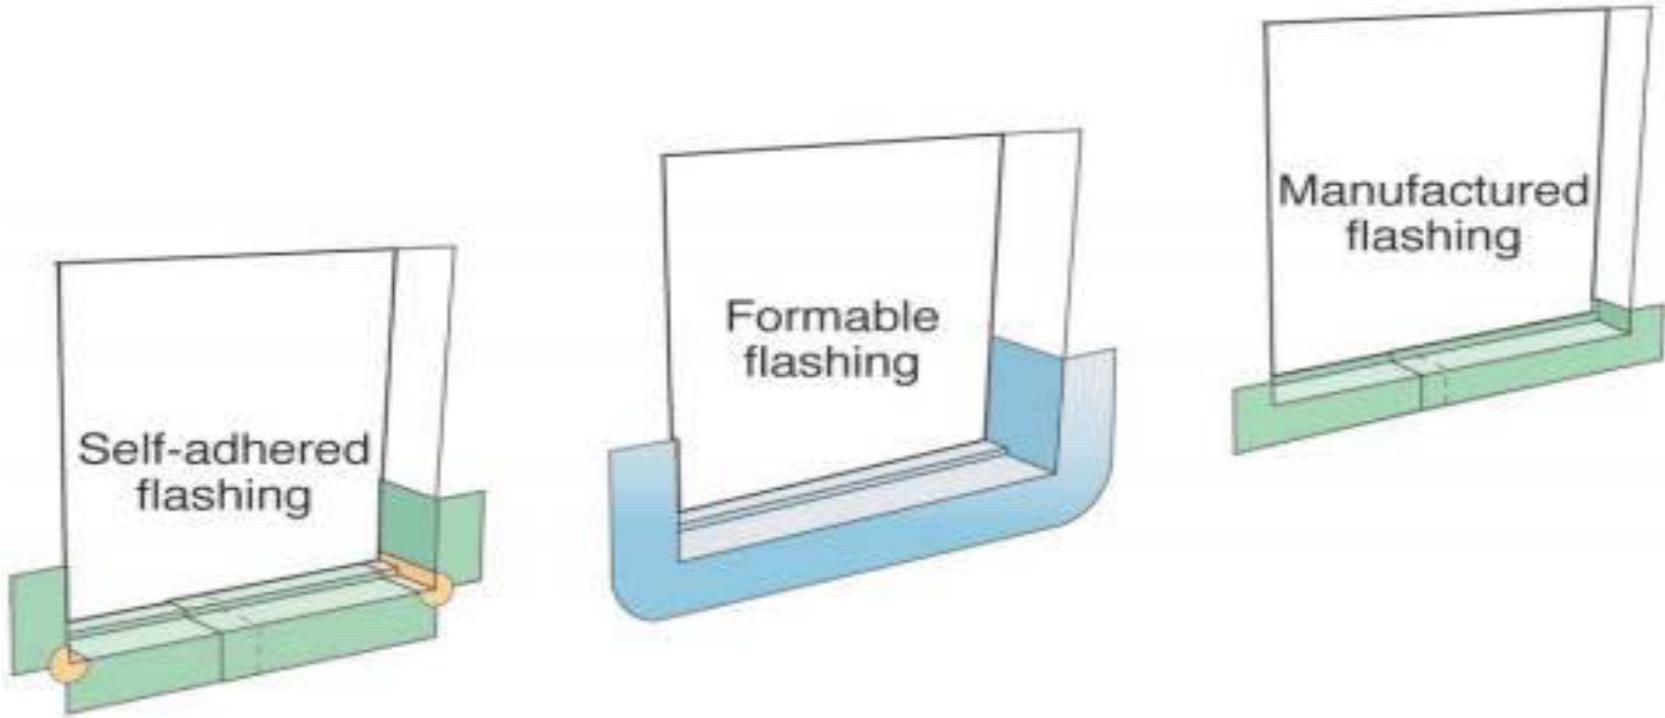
Configurations of Typical Sill Pan Flashing—Isometric
